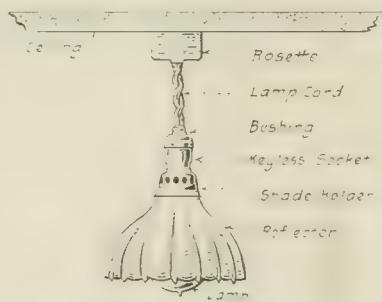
TYPICAL OUTLET OF THE KIND REFERRED TO IN TABLES
